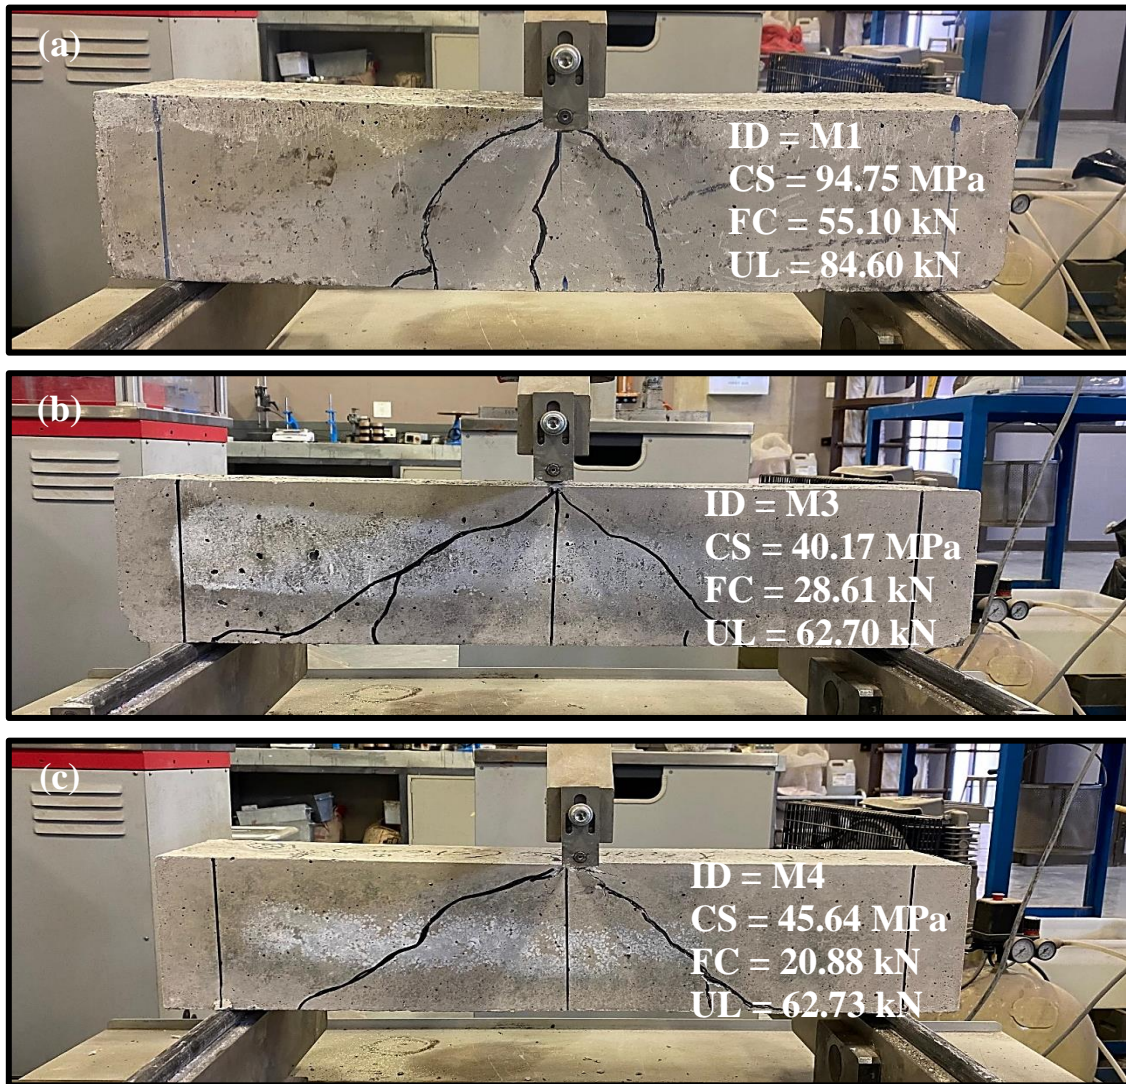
Observed failure modes of beams showing shear cracking in (a) M1 (b) M2 (c) M3
